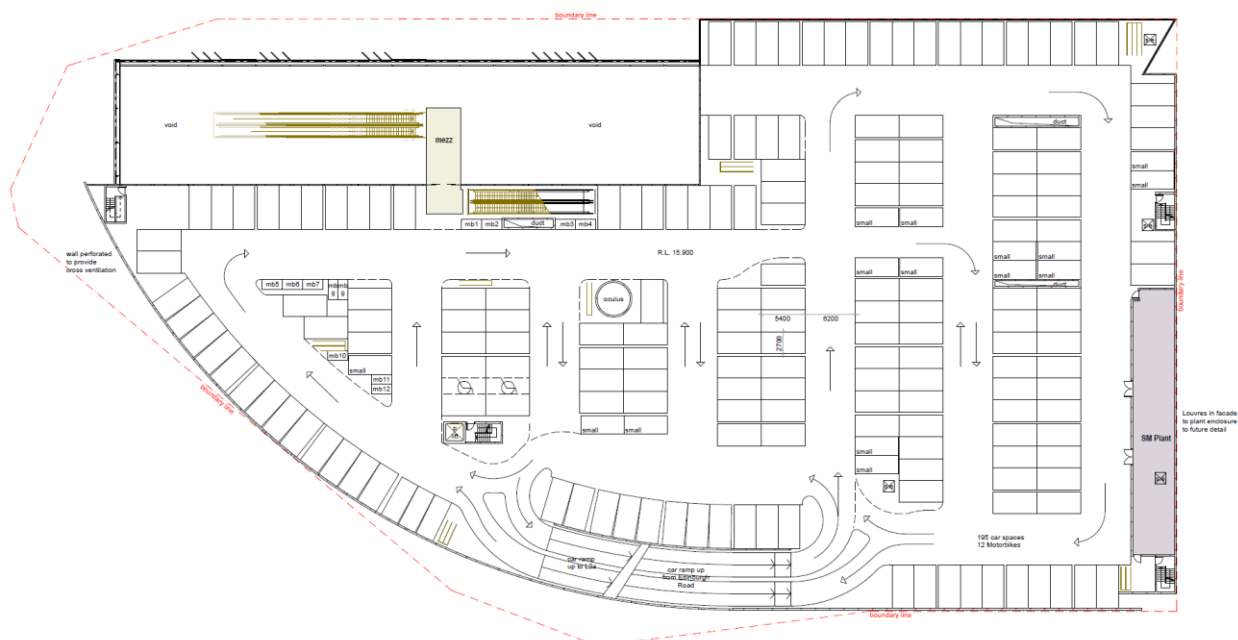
above can be compared to the approved Level 2 floor plan which is illustrated in Figure 10 below. This shows the previously proposed car parking arrangement and the continuation of the traveller on the northern side of the building.
